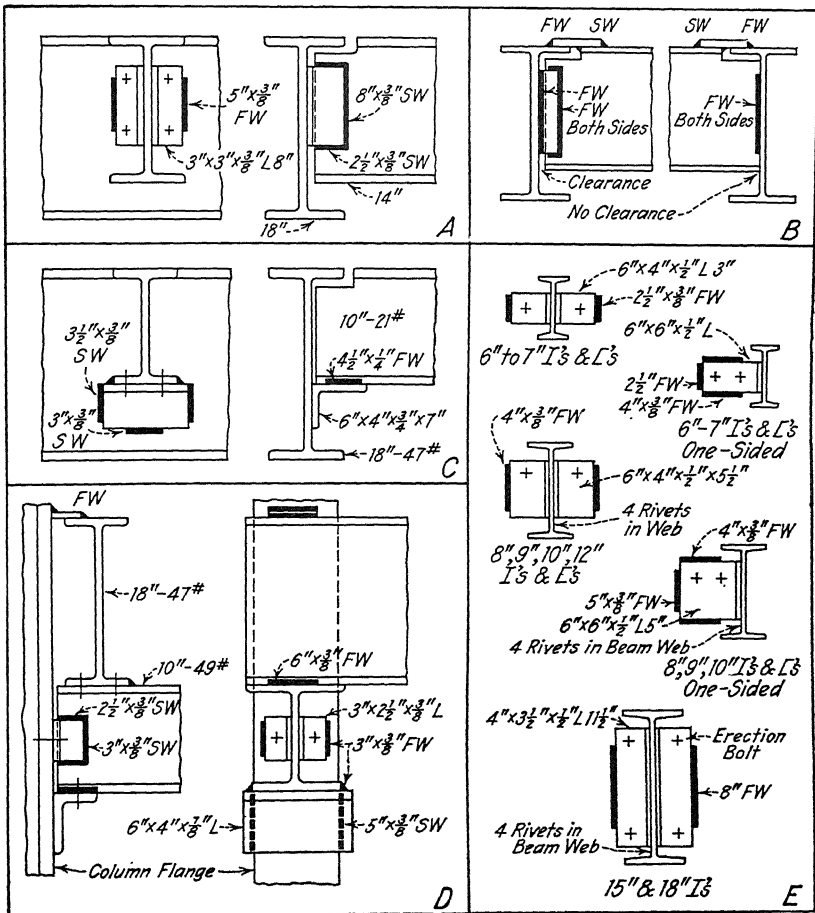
Structural Details. Sketches of Connections of Beams to Beams in All-Welded, and in Shop-Riveted, Field-Welded Buildings.
